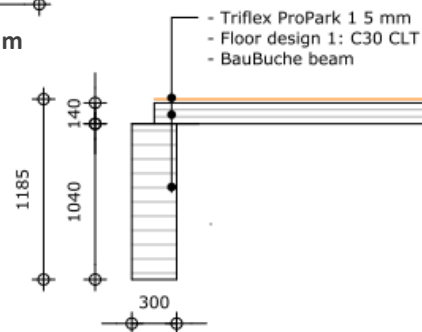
Floor design 1 BauBuche beam detail cross-section A-A in mm
